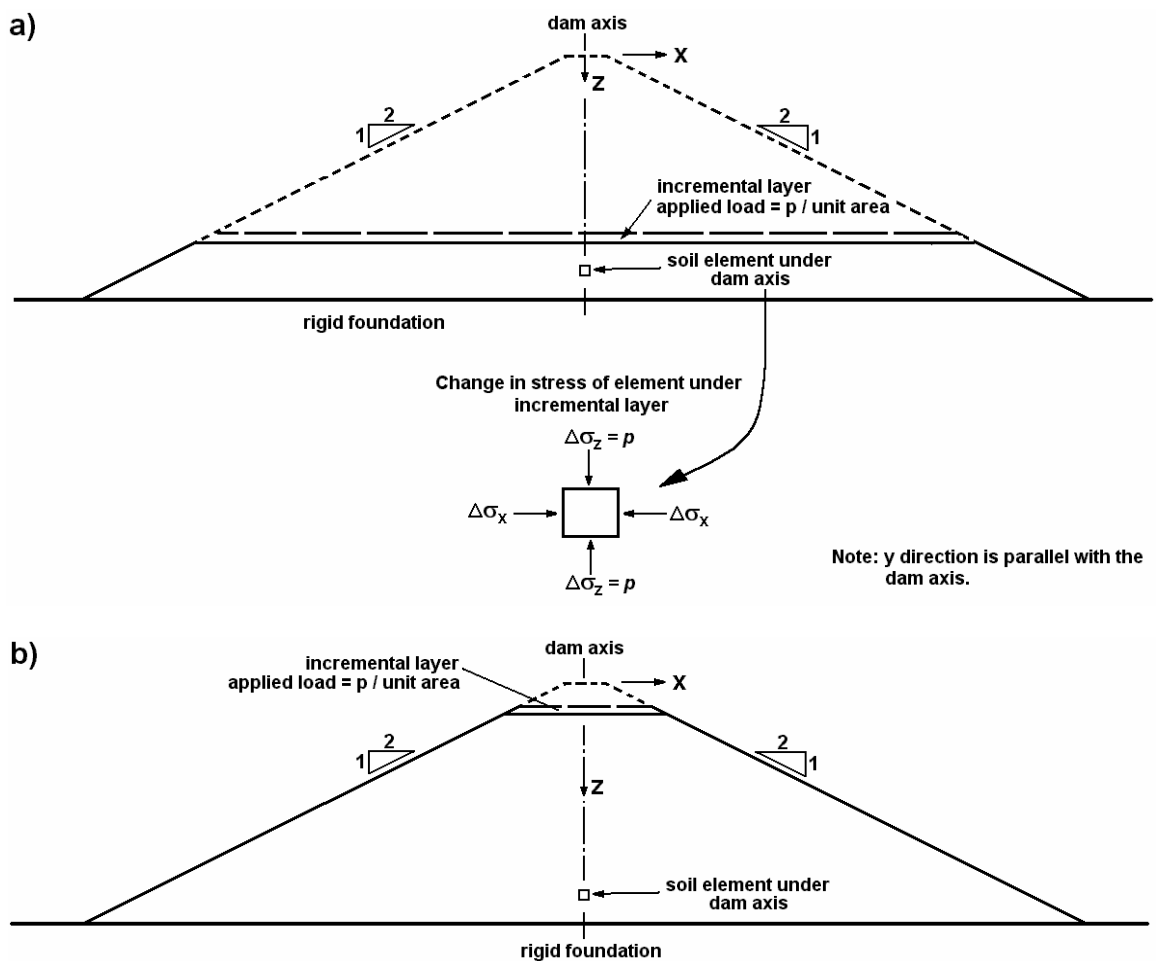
Embankment construction indicating (a) broad layer width to embankment depth ratio in the early stages of construction and (b) narrow layer width to embankment depth ratio in the latter stages of construction.
